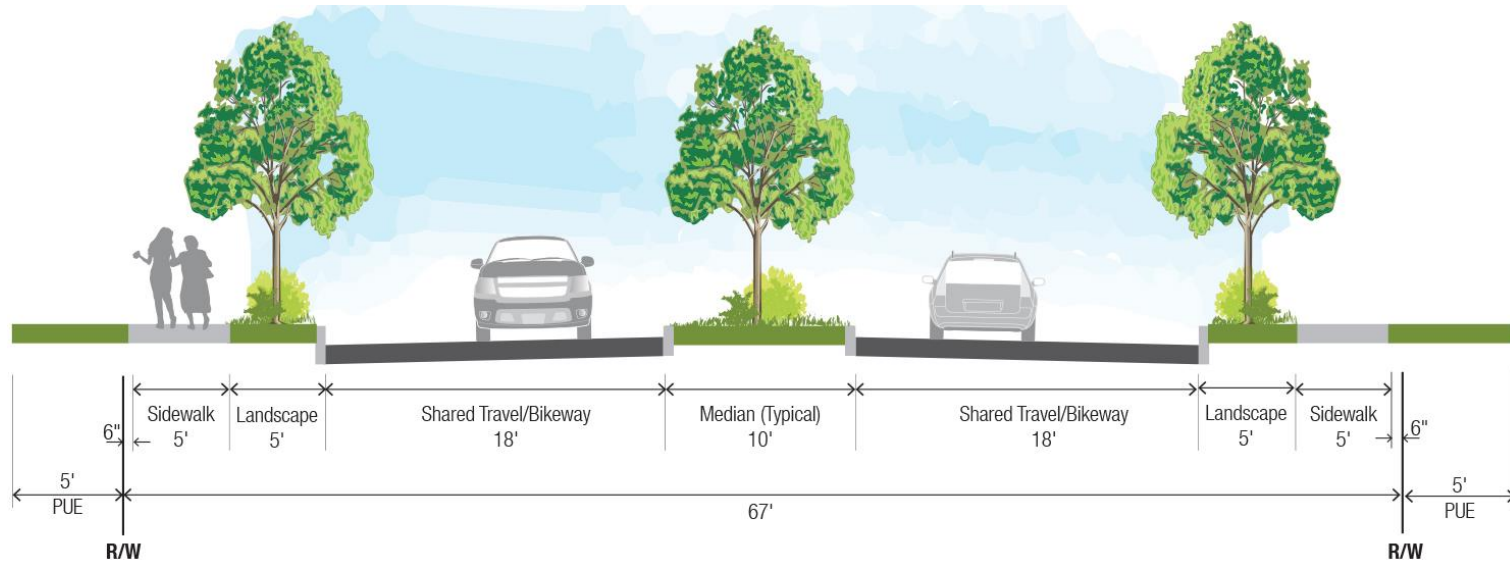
Conceptual Neighborhood Entry Street Section – Typical
